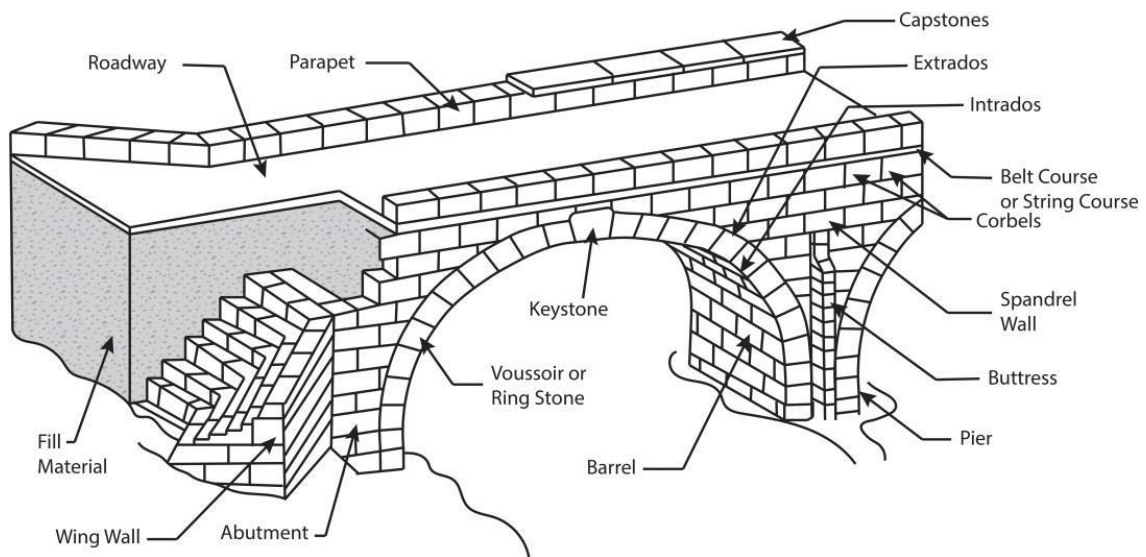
7: Elements of a masonry arch bridge (Pipinato, 2022).
